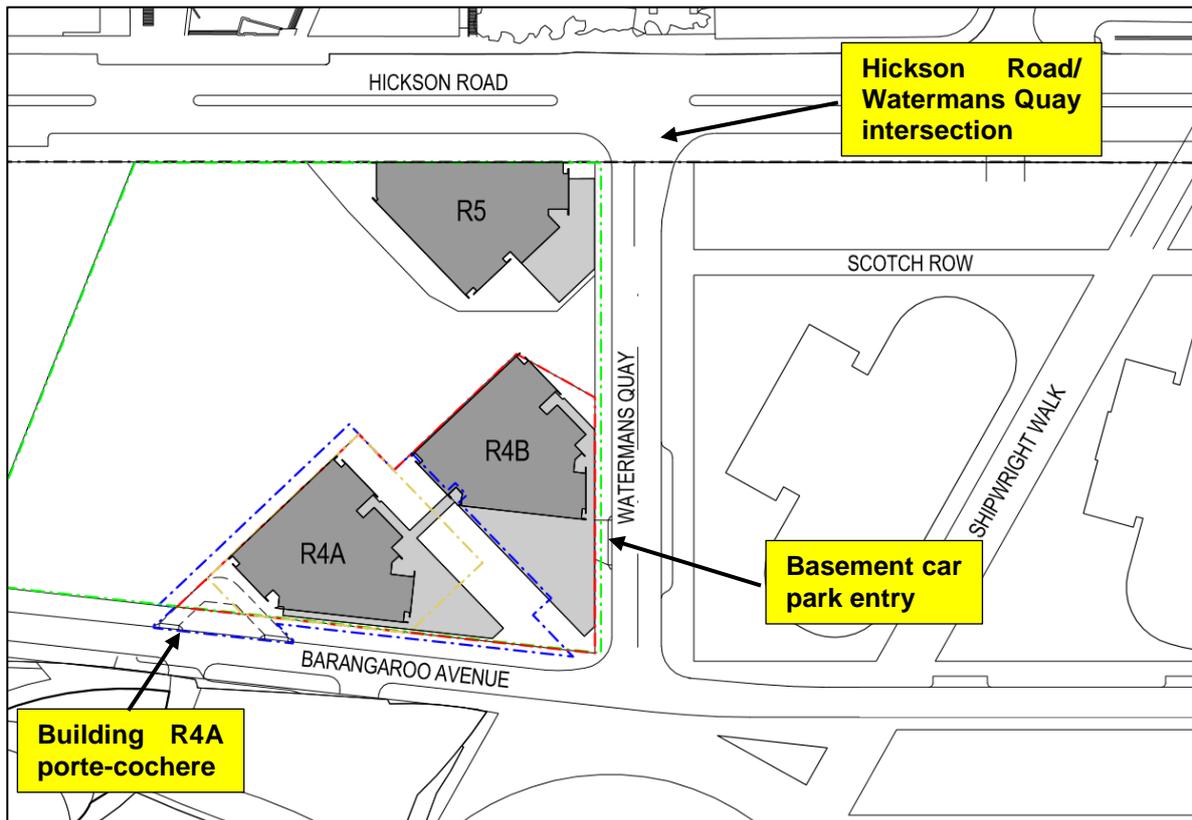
Intersection Site Plan (Base source: Architectural plans)
